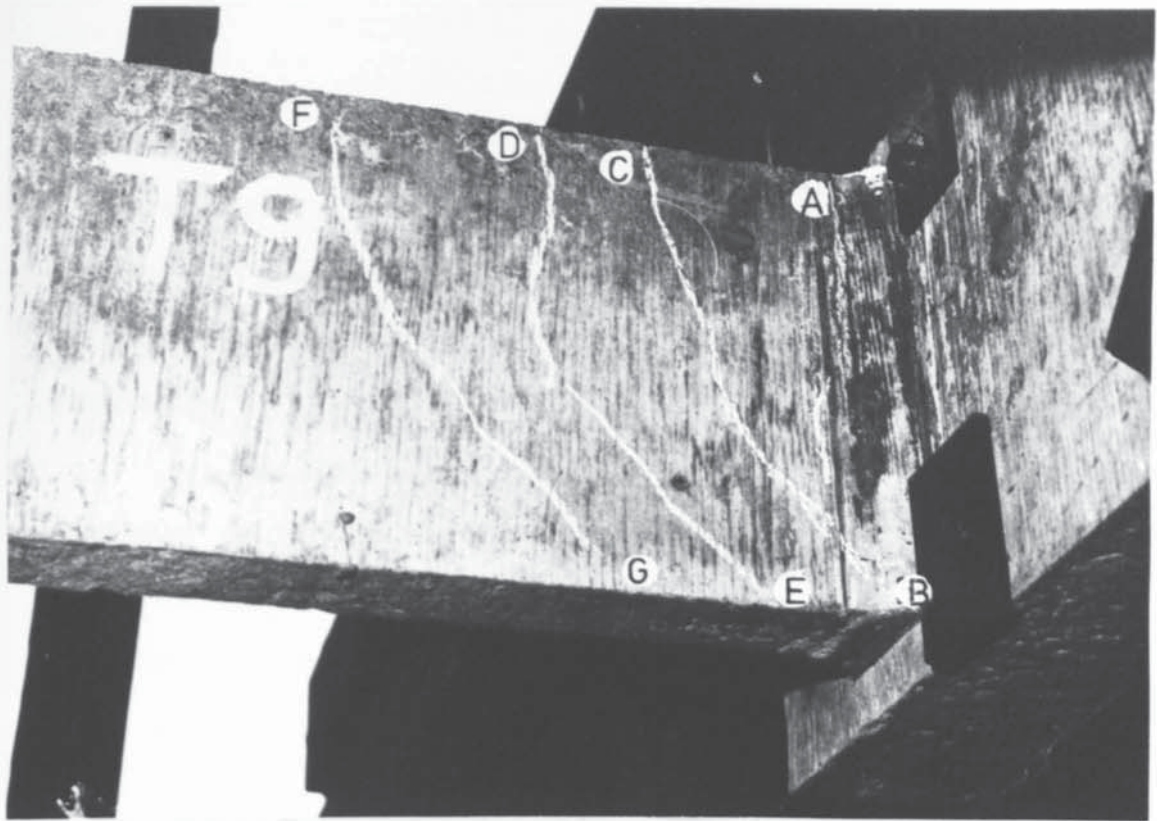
CRACKS IN A SHEAR WALL OF STRUCTURE 9
